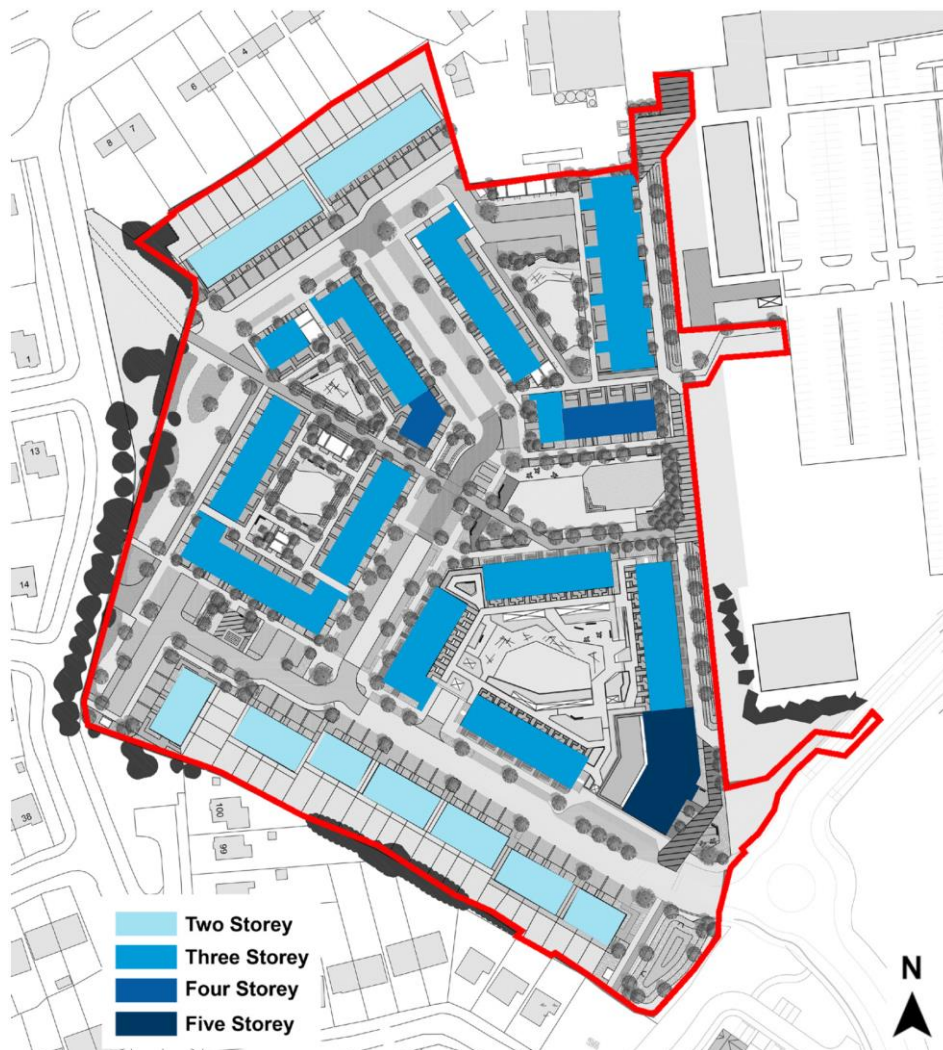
Proposed Height Breakdown. (Source: Architectural Design Statement, 2022).
